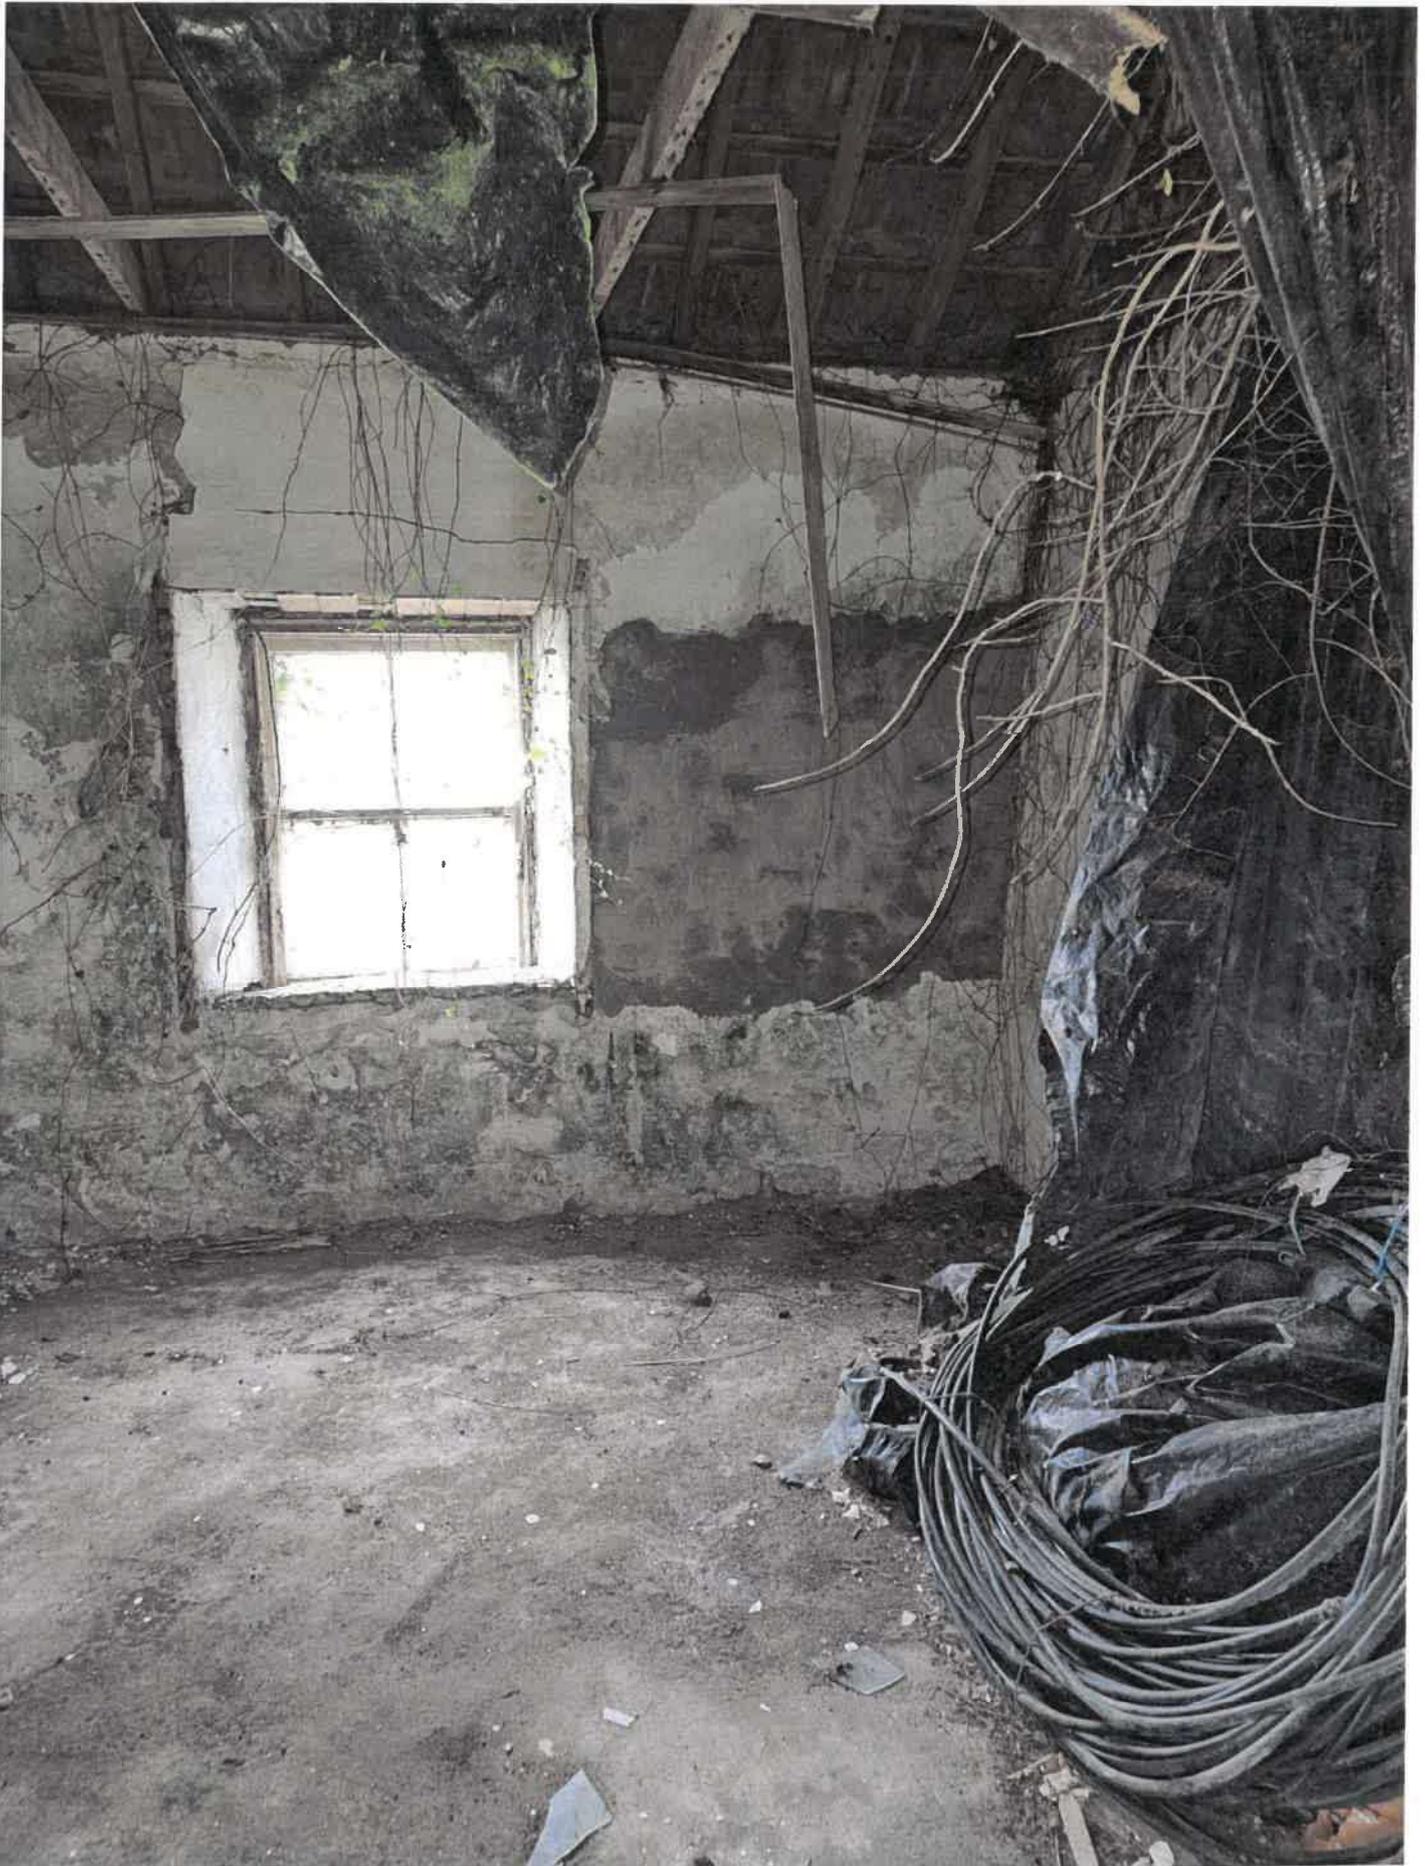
An internal view of the attic space. Note: daylight visible at ridge level where the ridge capping's and roof tiles are missing.
